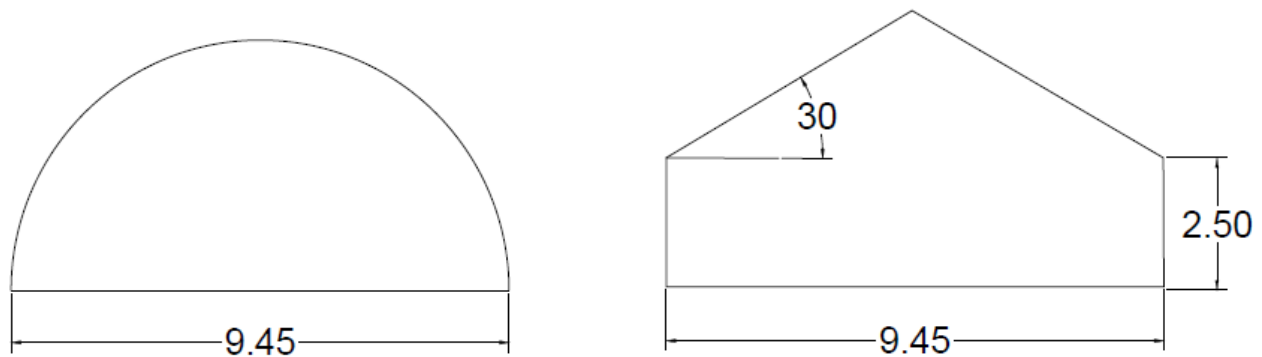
Cross section of the greenhouse and hoophouse tested. dimensions in meters
